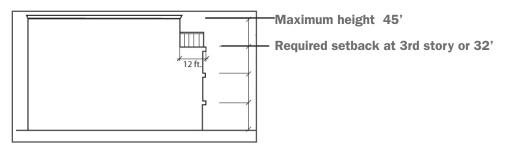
Maximum height and required step-back at 3rd floor and 32 feet.
